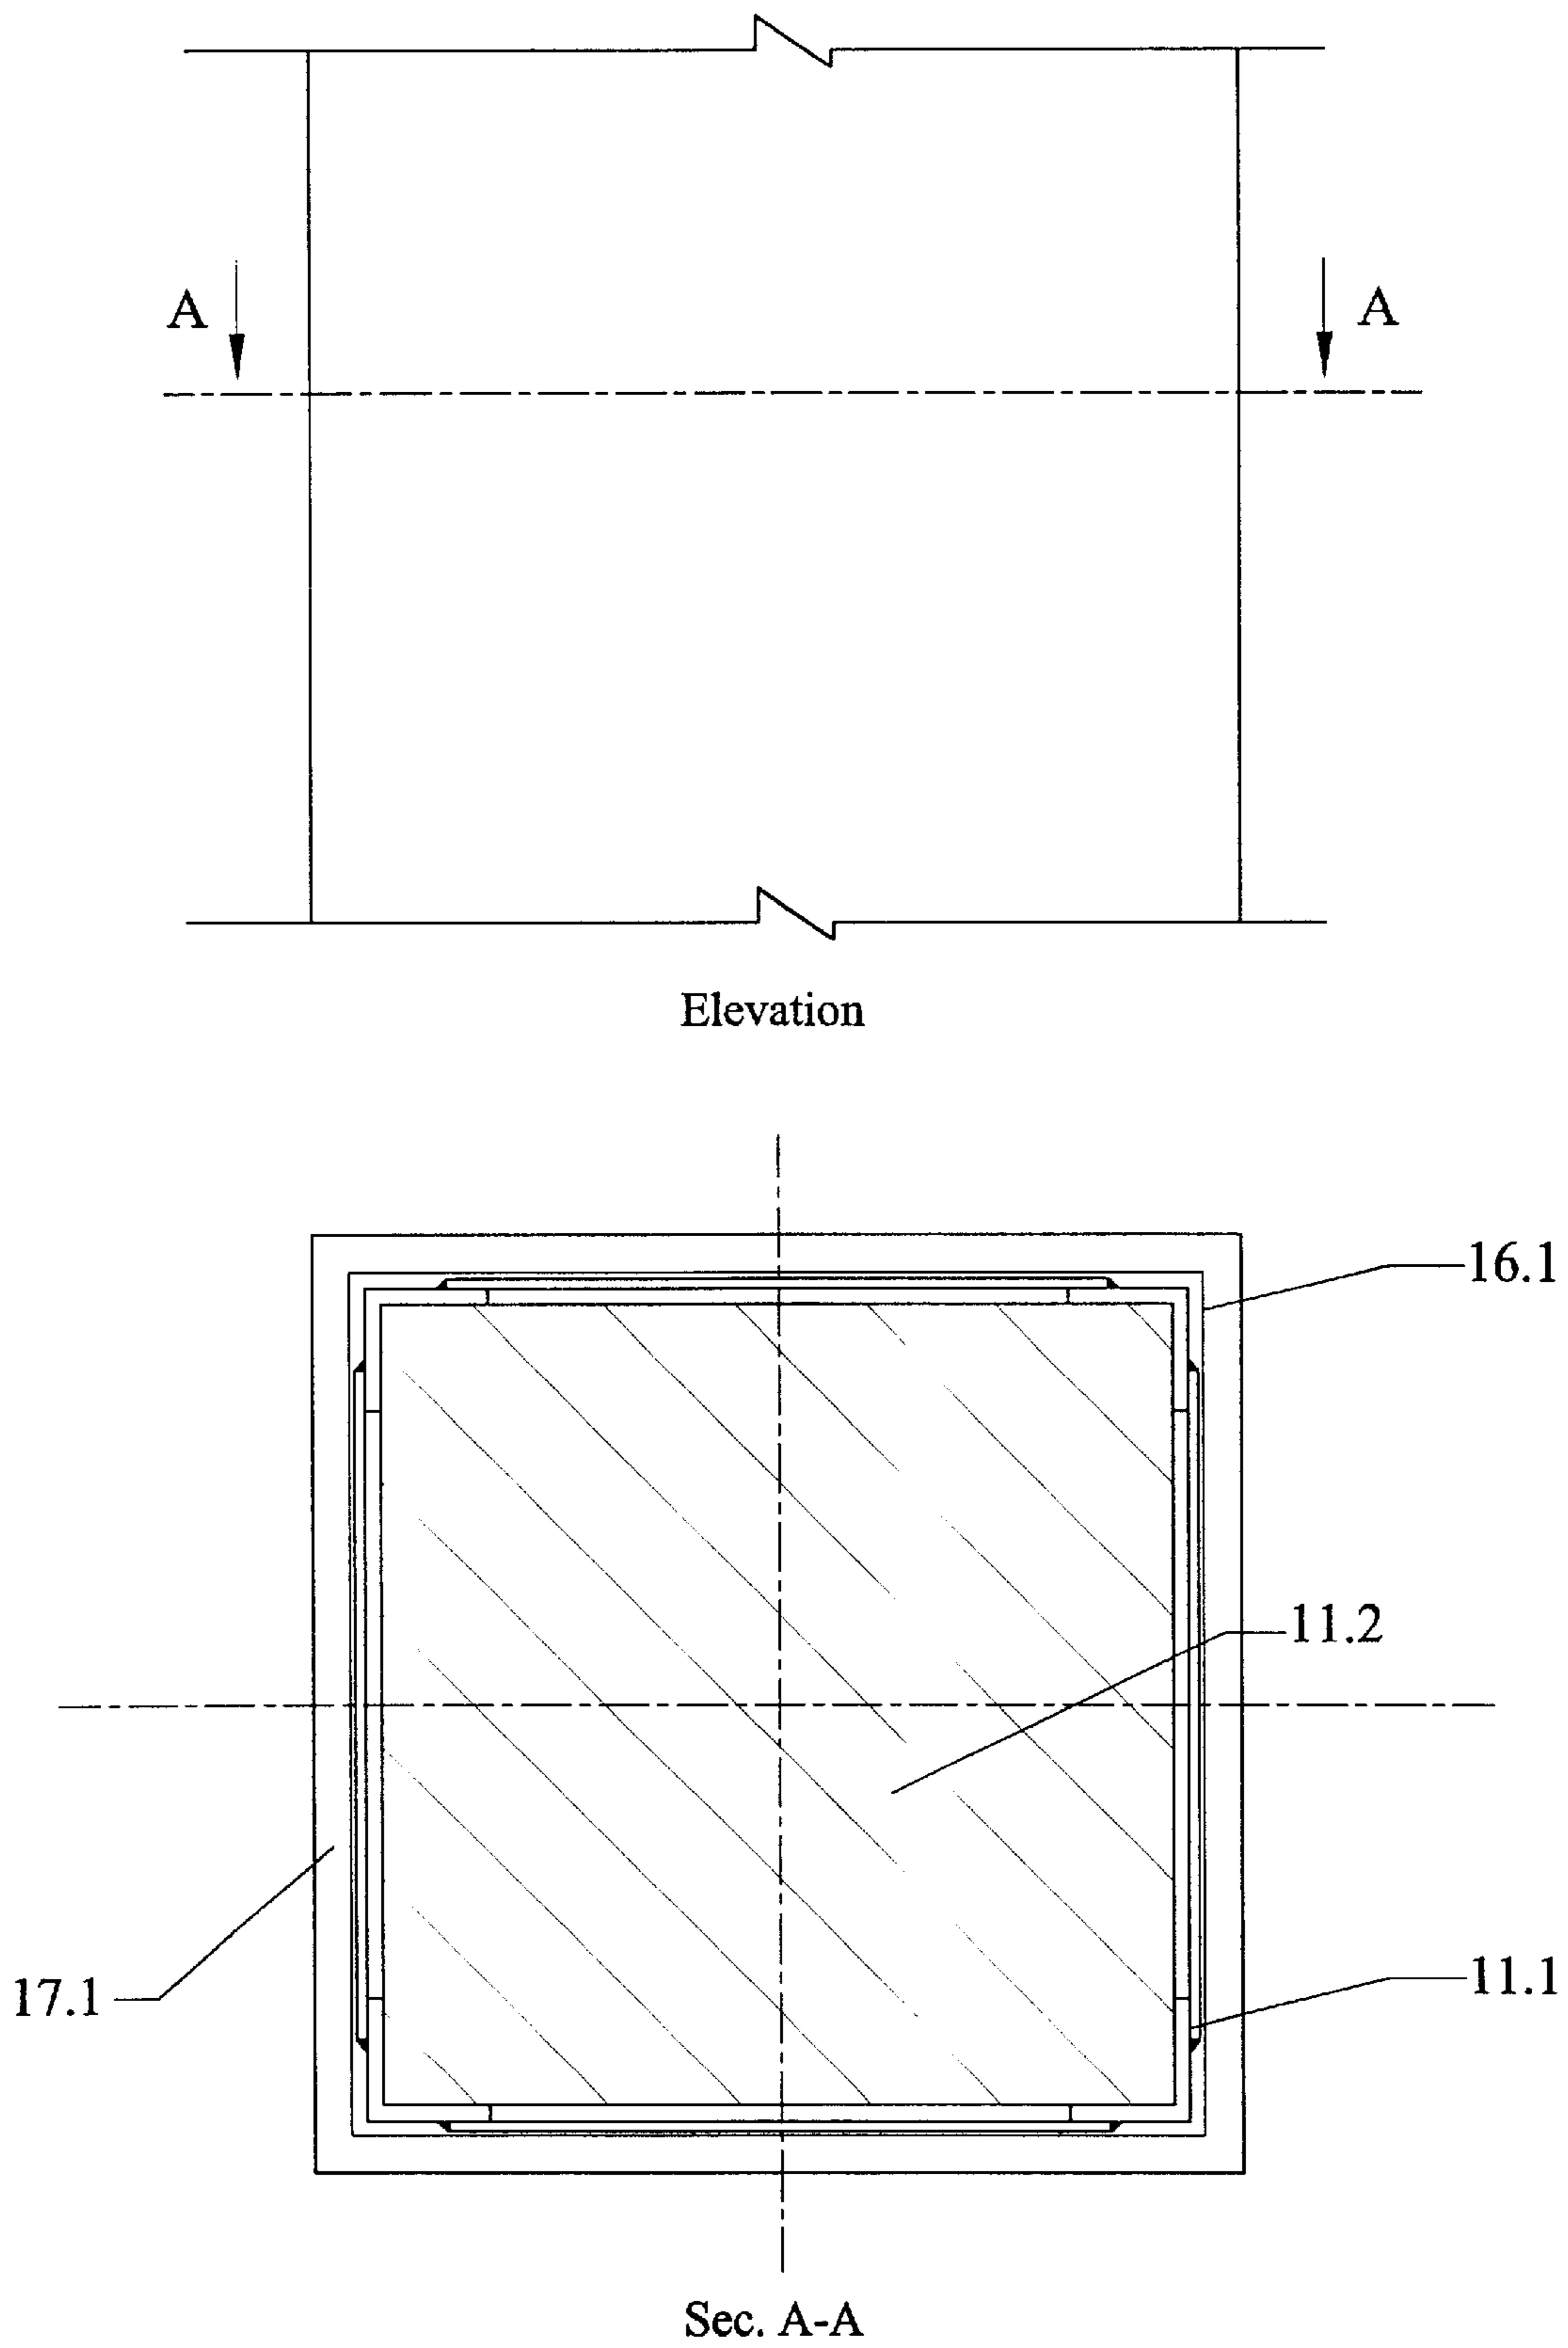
An Elevation and Section of a Column After the Strengthening Process Has Completely Finished by adding the plaster.
